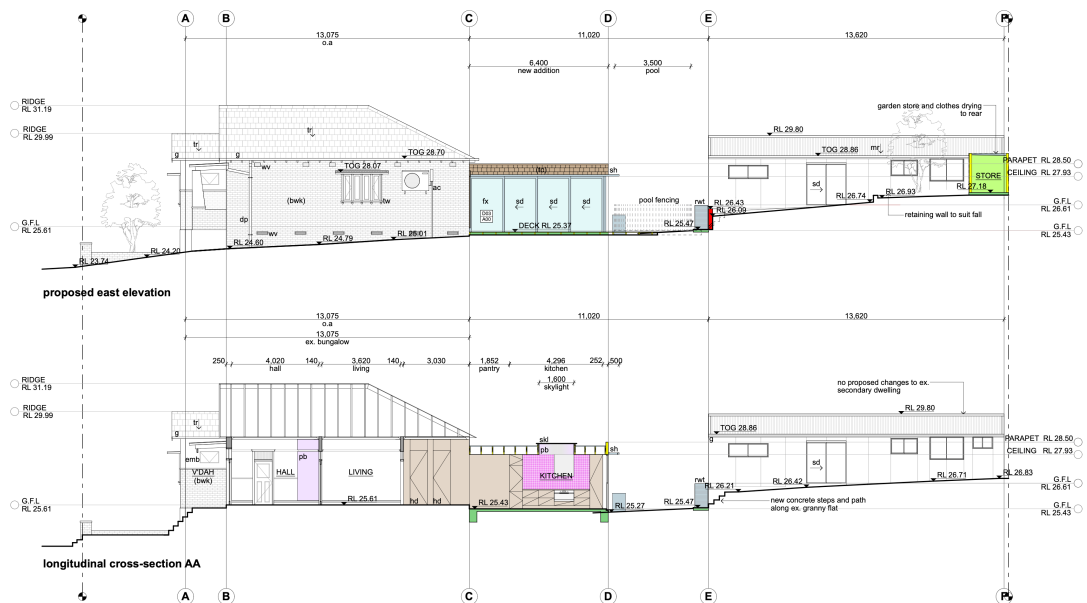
Proposed East Elevation & Cross section AA (Source: SWAD) - Not to Scale
